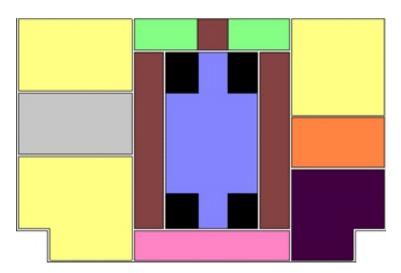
Ground Floor Plan Sepulveda Ambulatory Care Center, Los Angeles Source: Author's Field Work, 2021.
